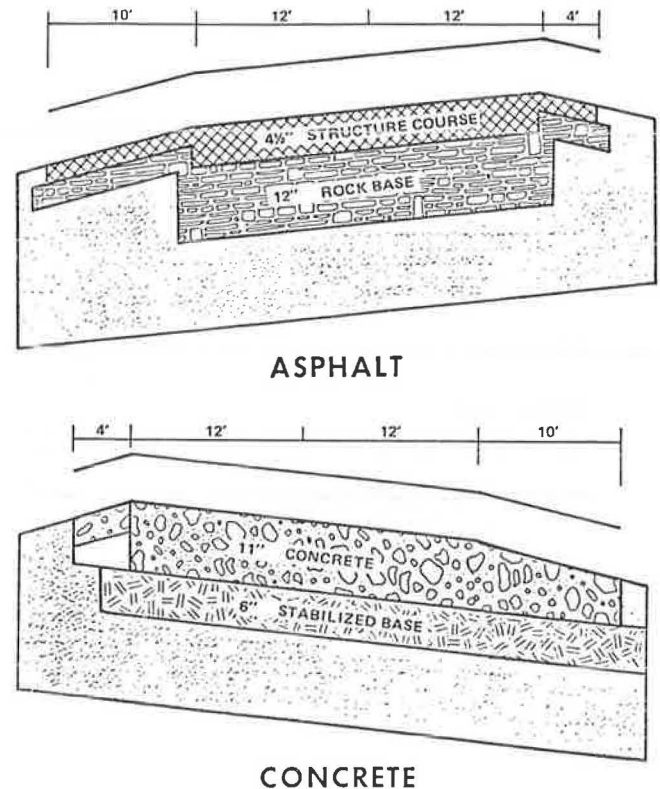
Typical sections of alternate pavement designs for initial construction.
